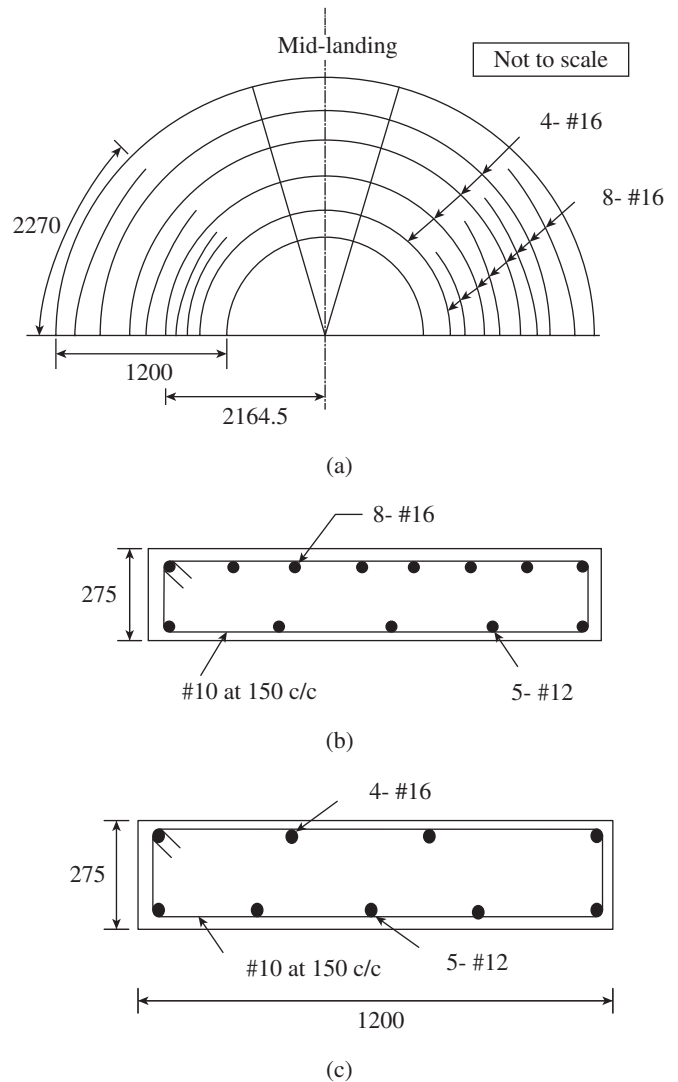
Helicoidal stair of Example 17.9 (a) Plan (reinforcement at top) (b) Cross section at support (c) Cross section at mid-span
